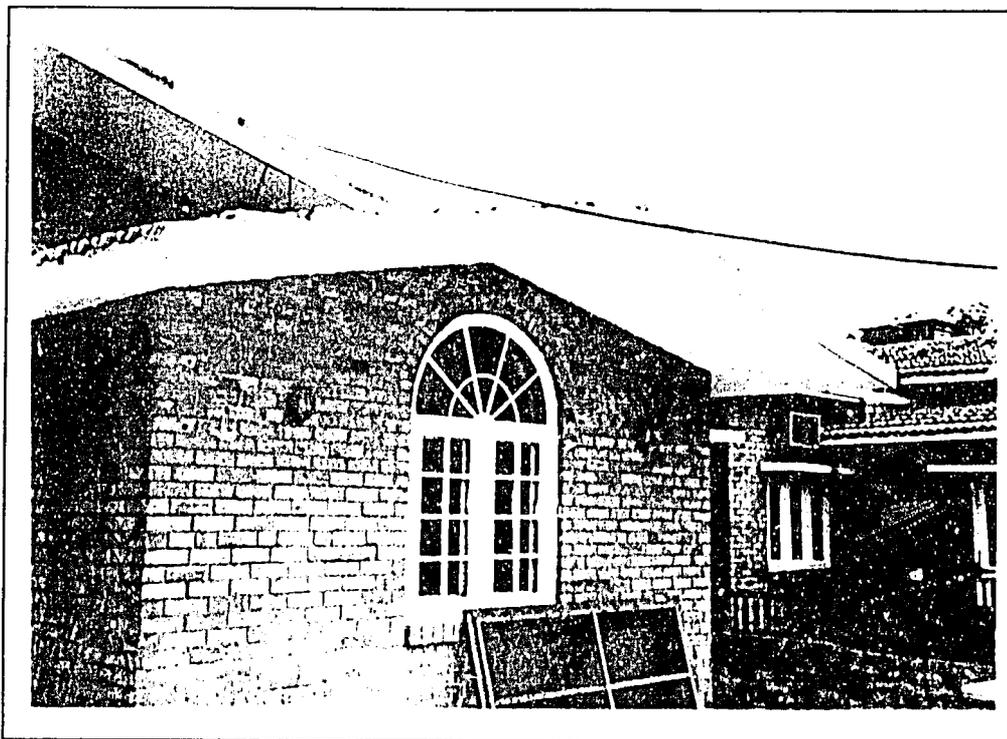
Peshawar CCSC Headquarters Building. Building #4 close-up detail.
